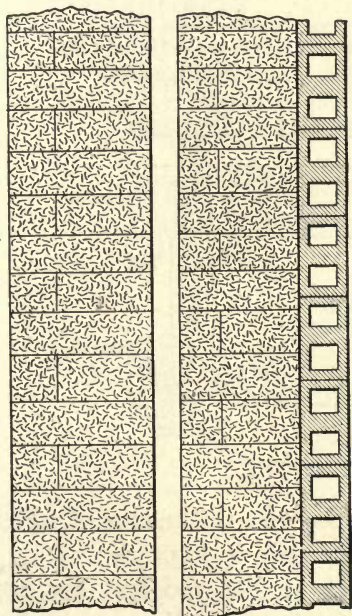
Brick Wall with Air Spaces and Tile Lining.
